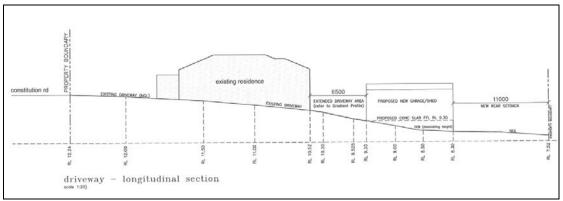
The driveway long section showing the single storey dwelling the proposed garage, storage, laundry and workshop.
